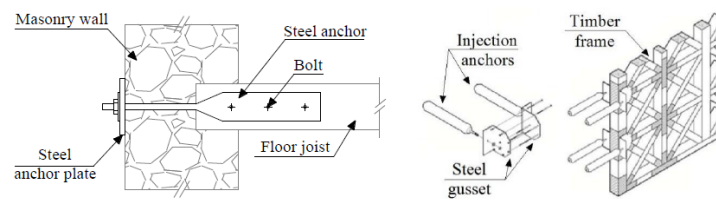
Testing of brick-timber joist connections with injection anchors [8])
